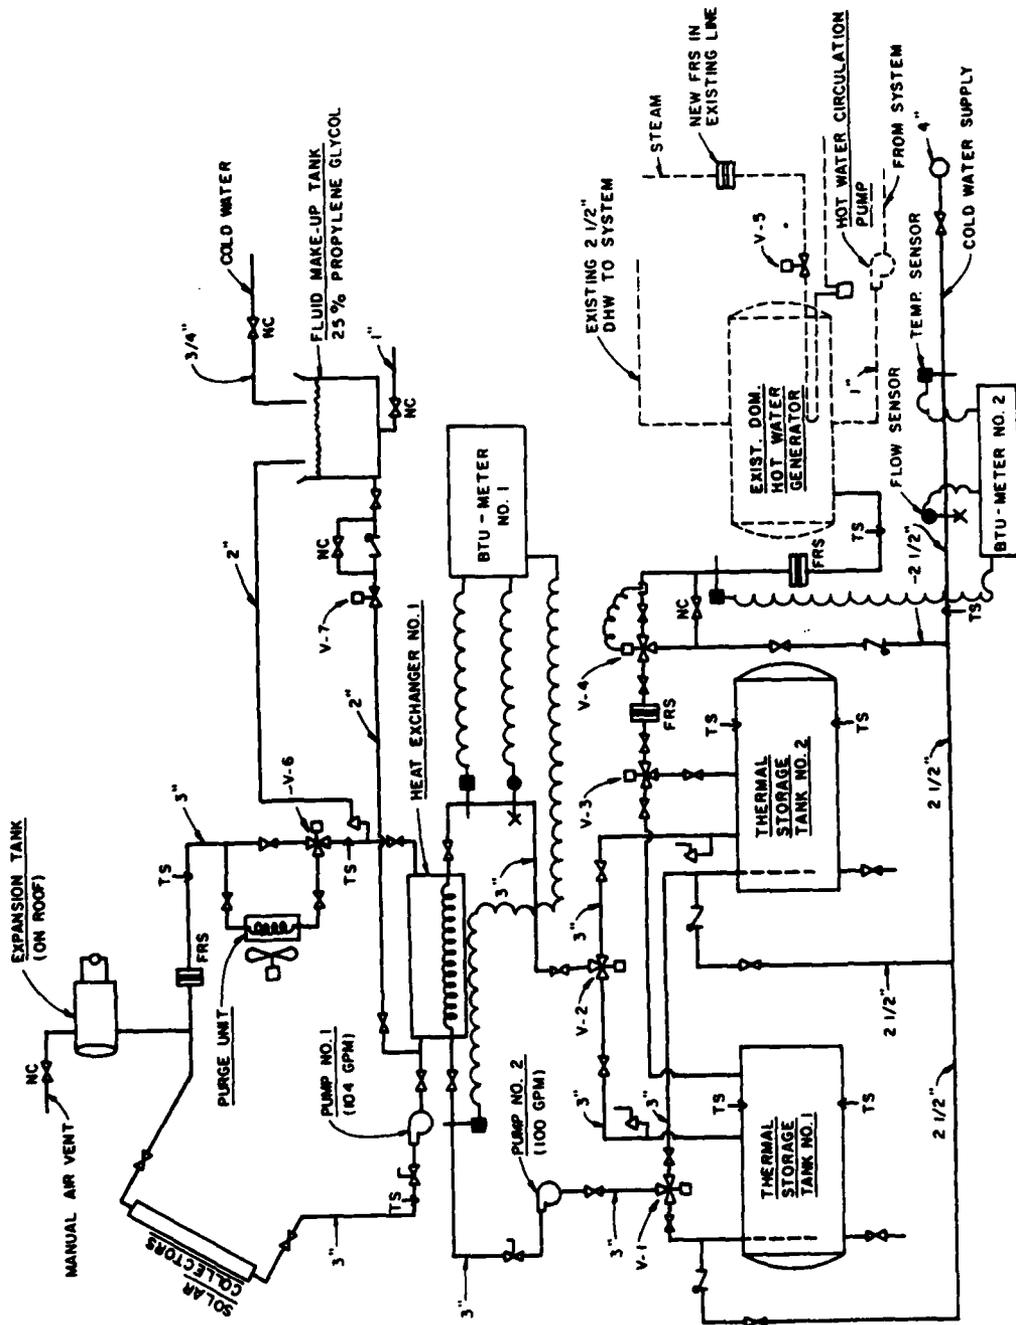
Location of BTU-Meters for EM Barracks Building at Fort Hood.
